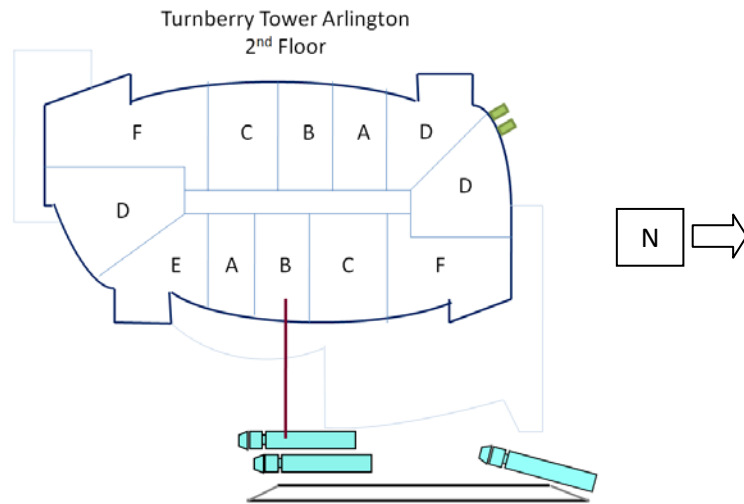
2<sup>nd</sup> Floor of Turnberry Tower Arlington
